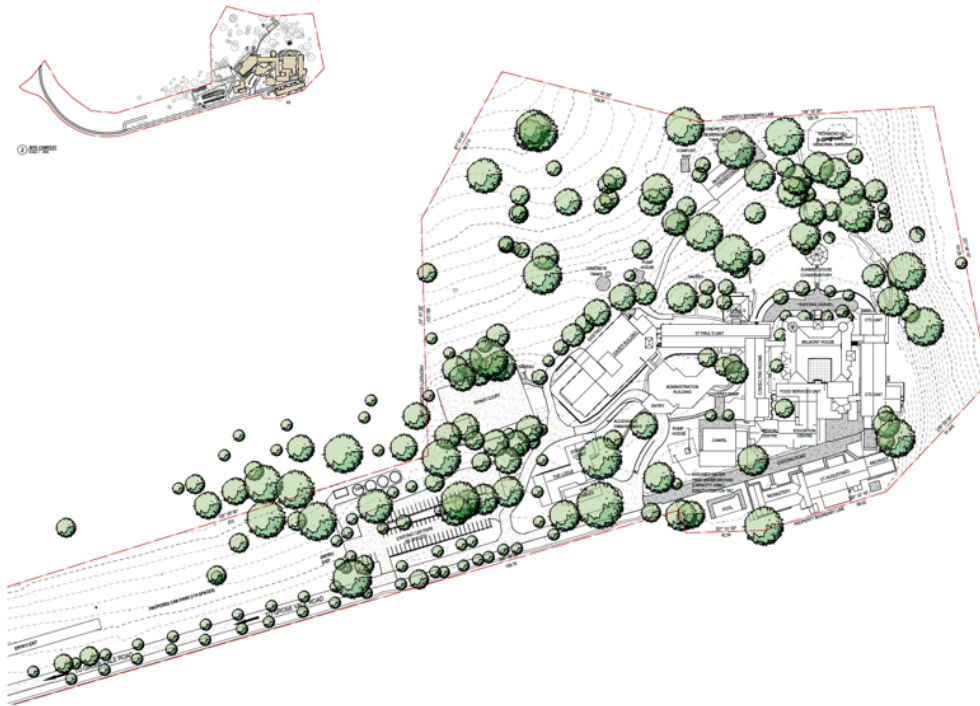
EXISTING SITE PLAN. St John of God Richmond Hospital.
